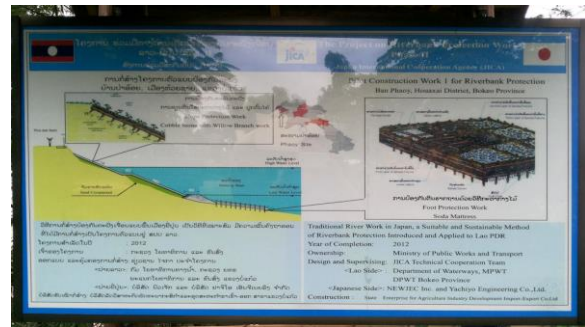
Signboard Installed at Pakthoay Site in Bolikhamxay Province
